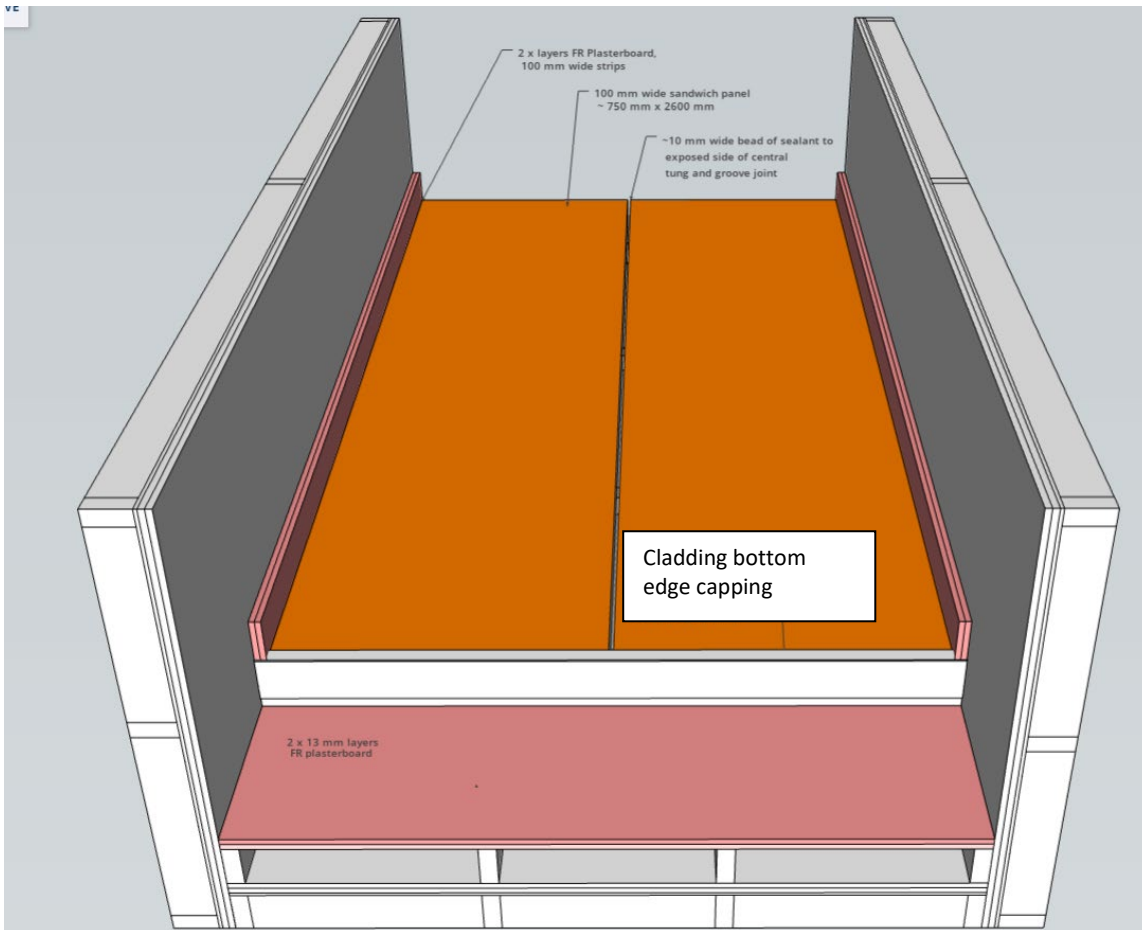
Bottom view of sandwich panel specimen installed to test rig
